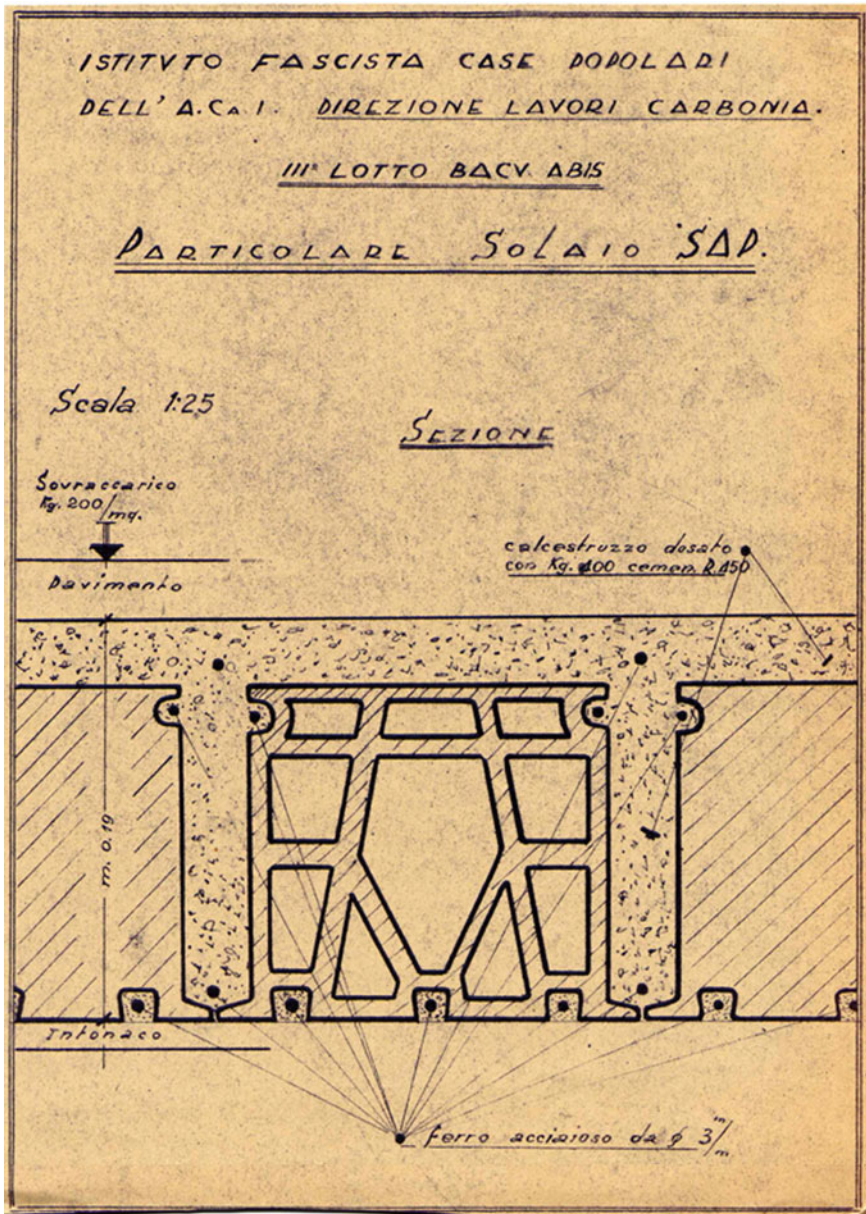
"Sap" type attic detail, namely a structure of in situ reinforced concrete beams, which not only permits less metal to be used but also does not require the use of wood as it is sufficient to insert a simple beam on the centre—line of the span, (Carbonia, AREA record office)
